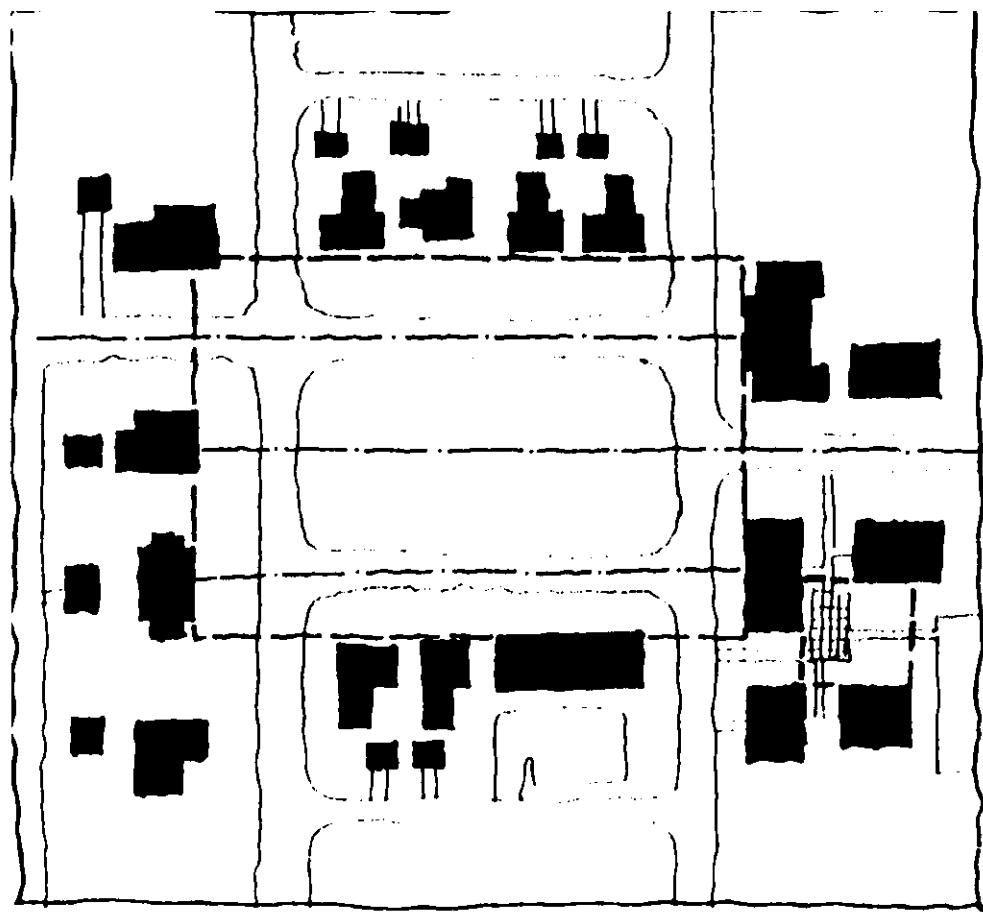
Spaces framed by buildings should be geometrically logical and/or architecturally formal.
